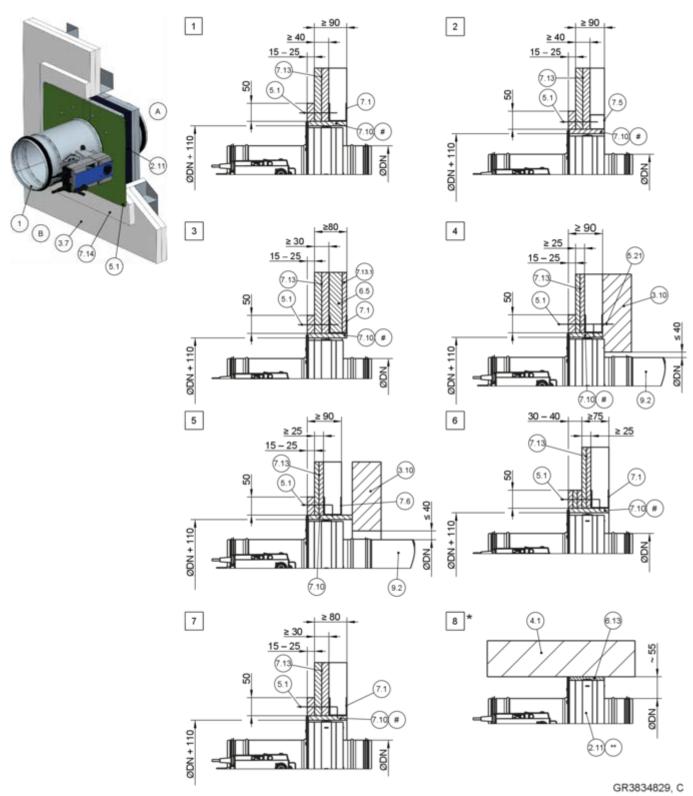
Dry mortarless installation into a shaft wall with metal support structure, with installation kit TQ2
